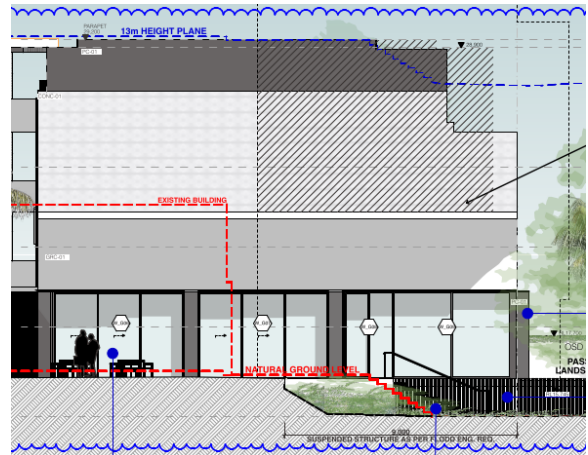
Proposed elevation, height exceedance at the upper level, Source: MHNDUnion
